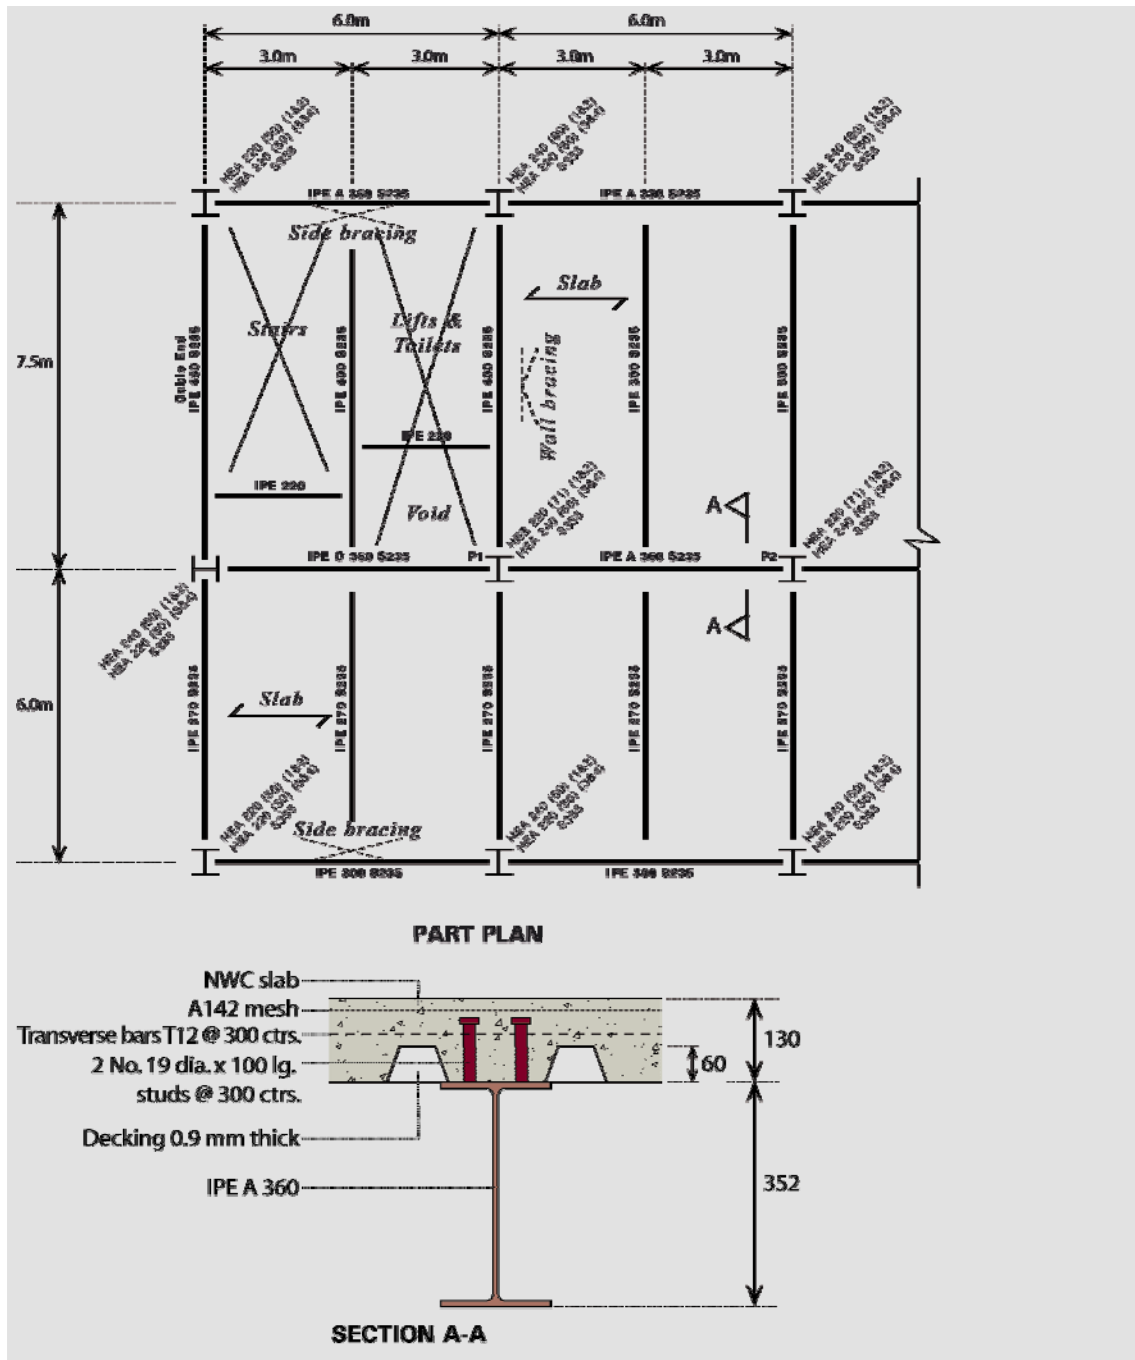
Short-span composite beam – example of floor steelwork arrangement for 4-storey rectangular plan building
